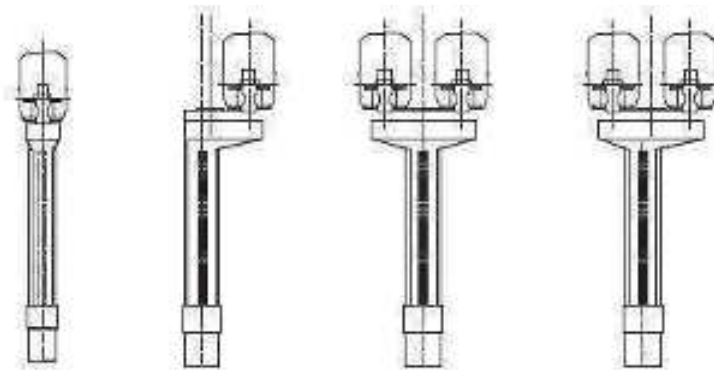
Cross Section of Single Pier of Viaduct
